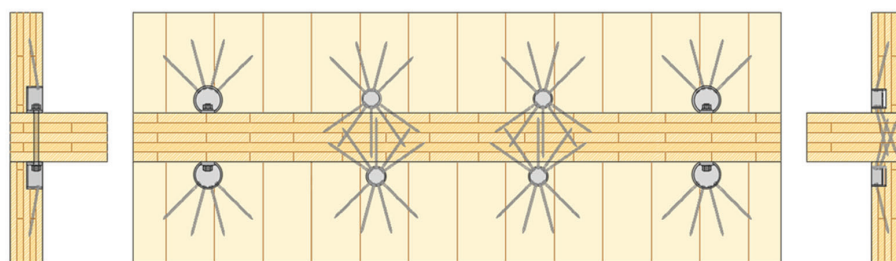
Combination of RING90C and RING60T for typical wall-to-floor connection
